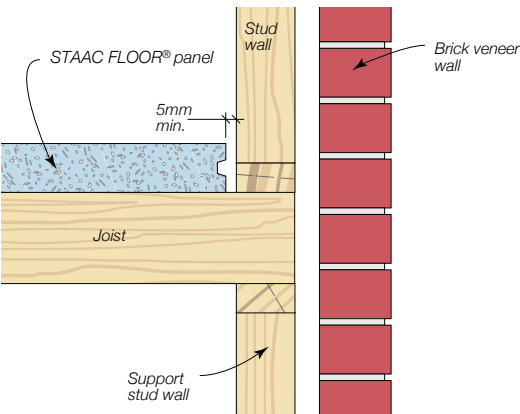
STAAC FLOOR® End Support for Fitted Flooring
